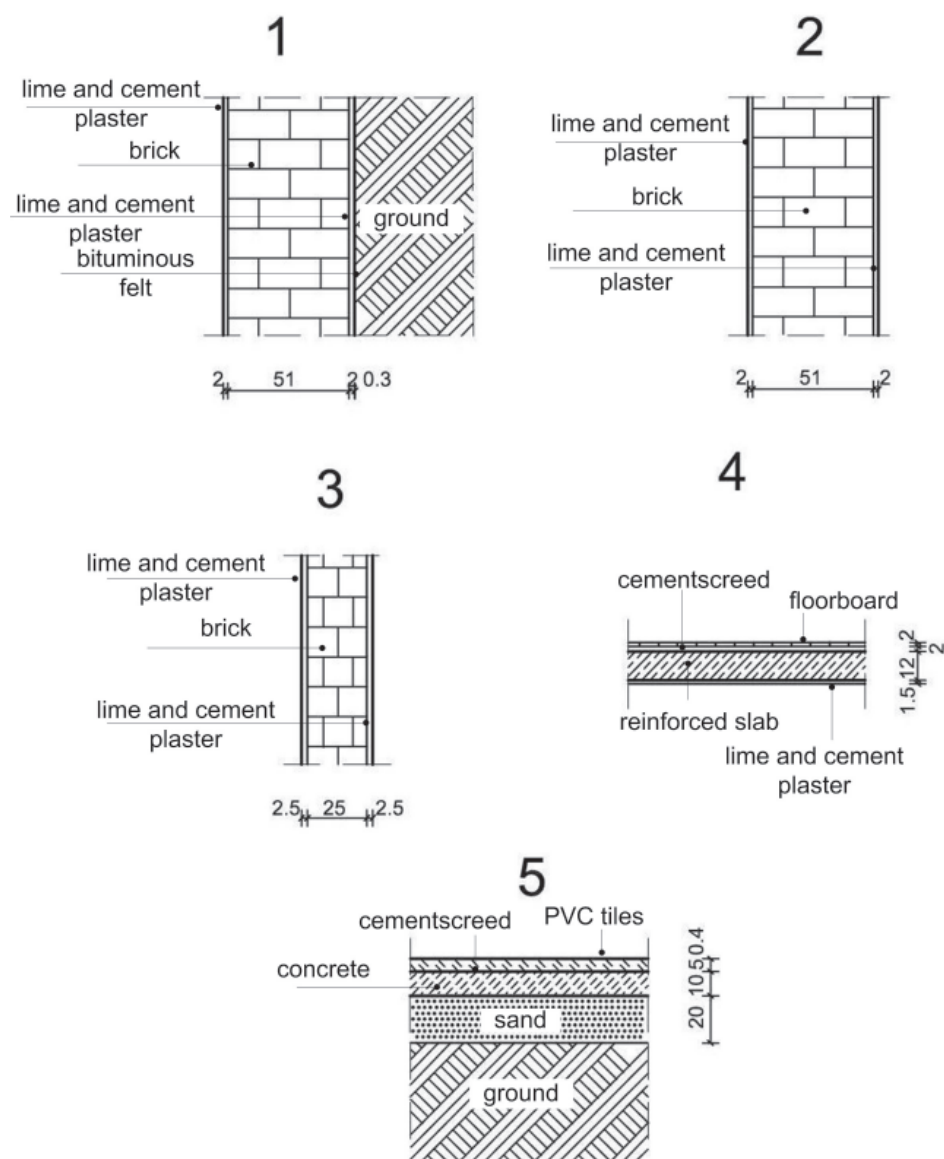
Structure of partitions: 1 – external wall in contact with the ground, 2 – external wall to outside air, 3 – internal wall, 4 – ceiling, 5 – floor
